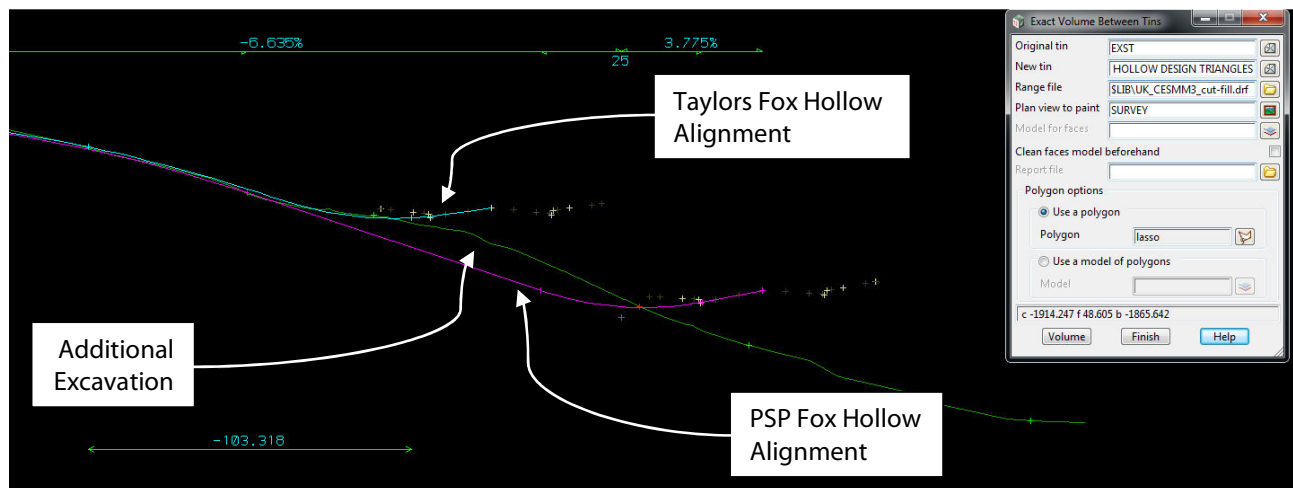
Fox Hollow Drive / Connector Boulevard Intersection Grading
